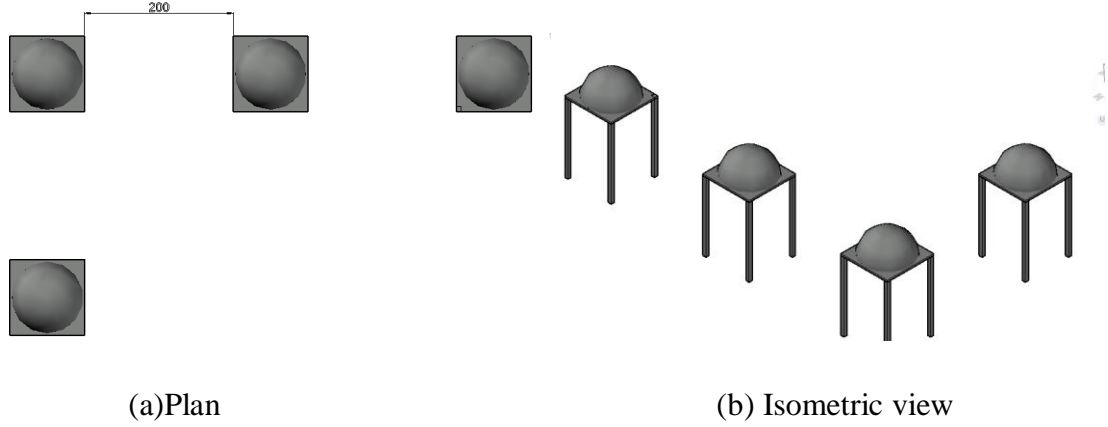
9 Plan and Isometric view of arrangement of domical roof buildings in L shape at 100 mm spacing
